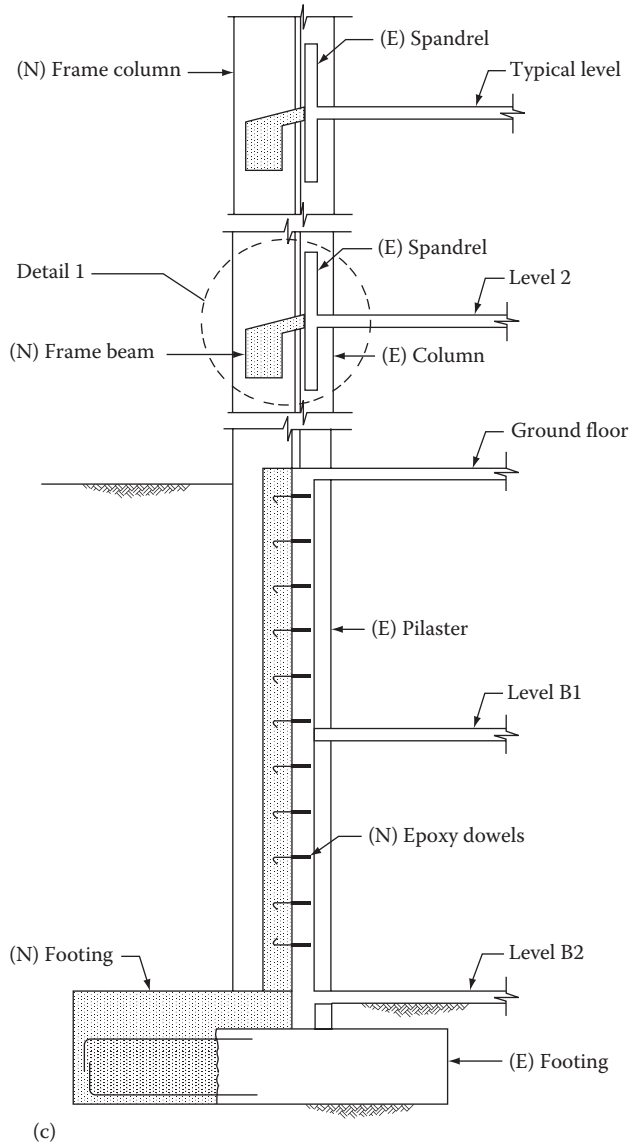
(Continued) Seismic upgrade of a concrete hospital building with an external concrete moment frame. Modifications are restricted to the periphery of the building to keep the building operational with minimal interference to its functionality: (c) section through longitudinal frame. (Continued)
